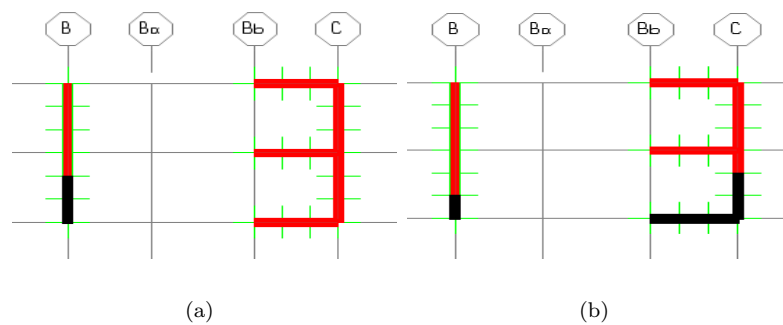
Wall segments undergo yielding (a) Uncracked Slabs and Beams Push-X (b) Uncracked Slabs and Beams Push-Y.
